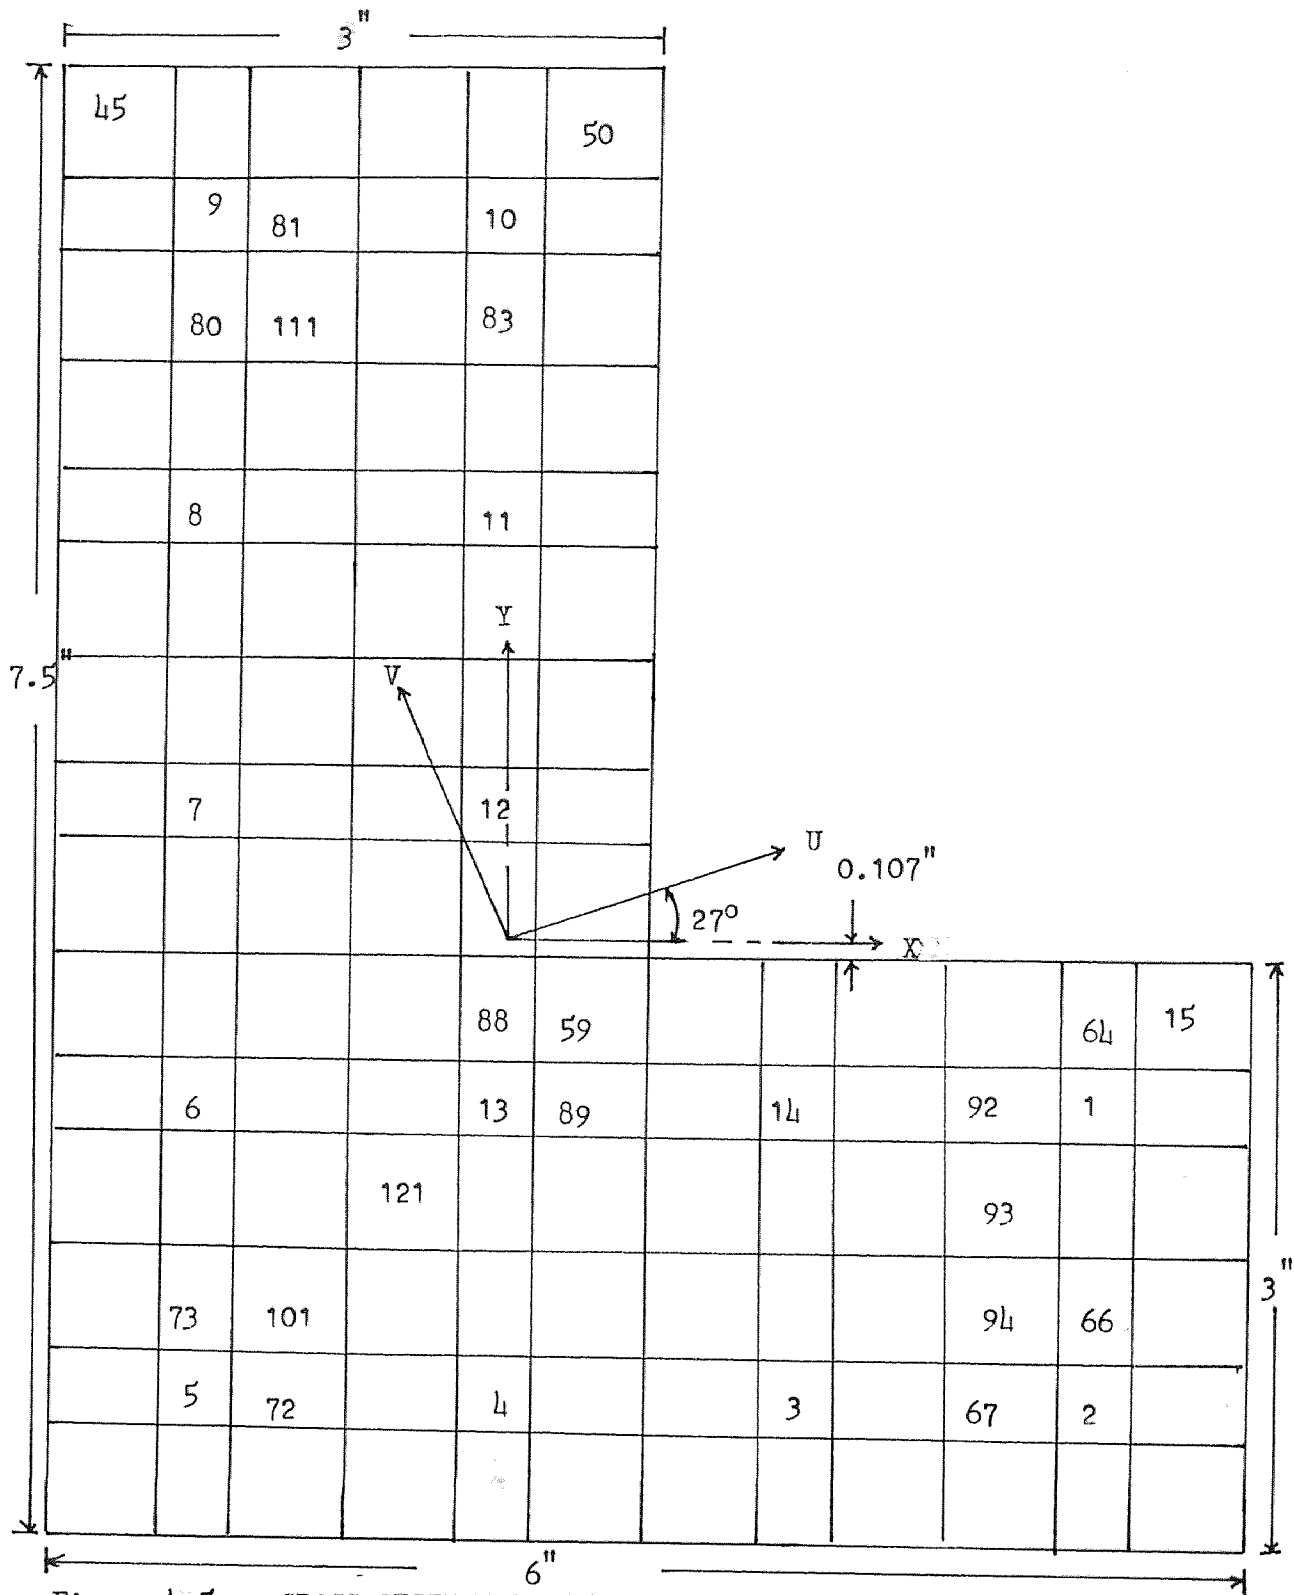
CROSS-SECTION SHOWING ALL ELEMENTS
